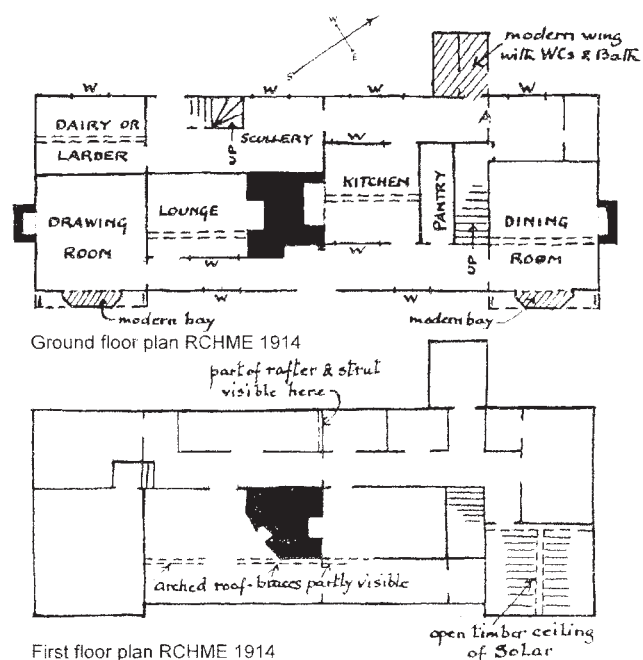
RCHME plan of Baythorne Hall in 1914
